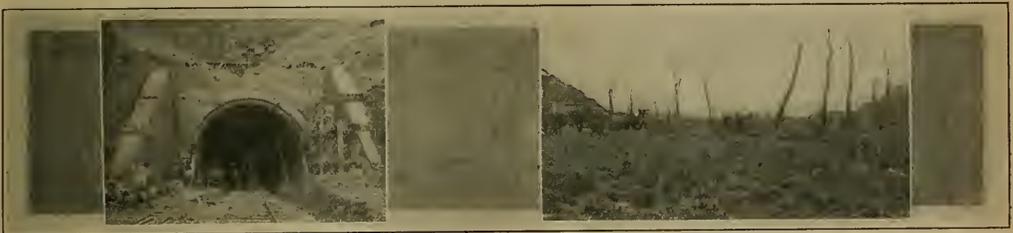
Left, Vauxaillon Tunnel; Right, St. Benin Viaduct
